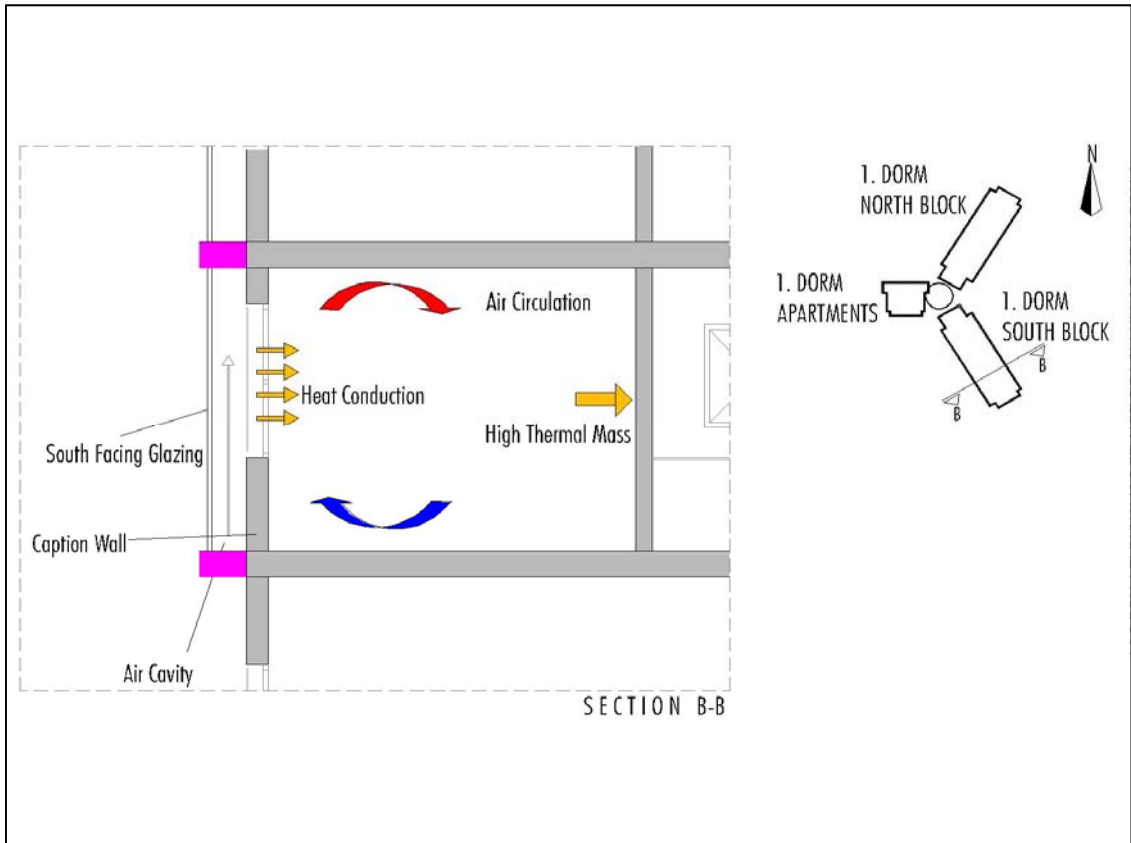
Trombe Wall Application in Detail – Floor Section.
